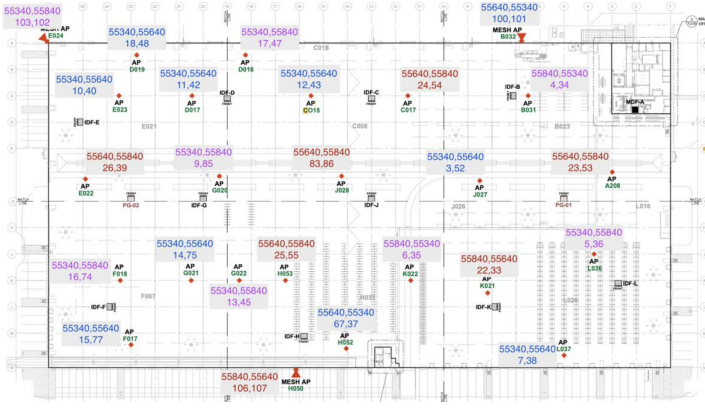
CBRS Indoor Deployment and Floor Plan.
